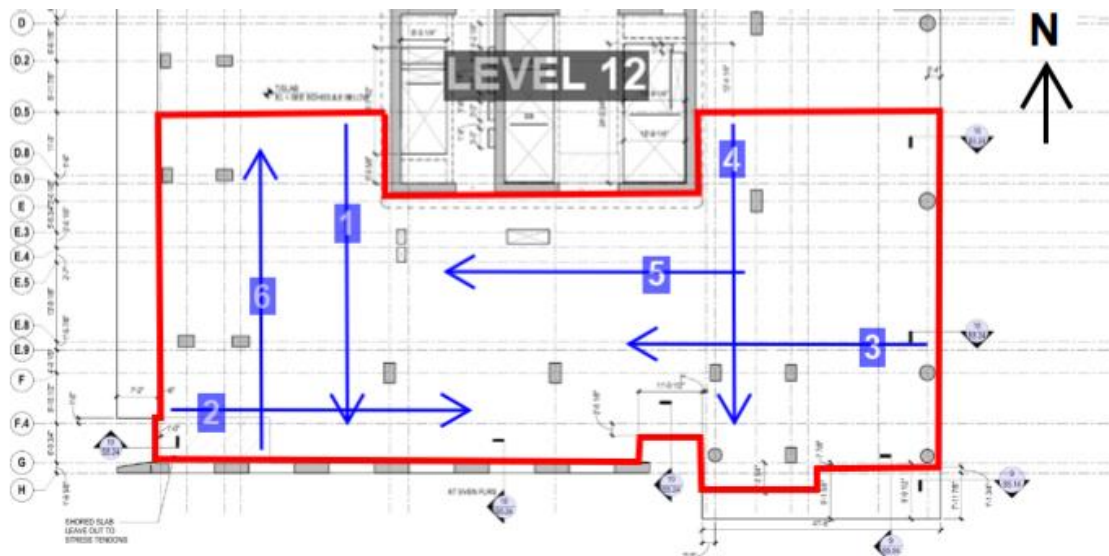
Case Study 12th Floor Testing Report Runs
